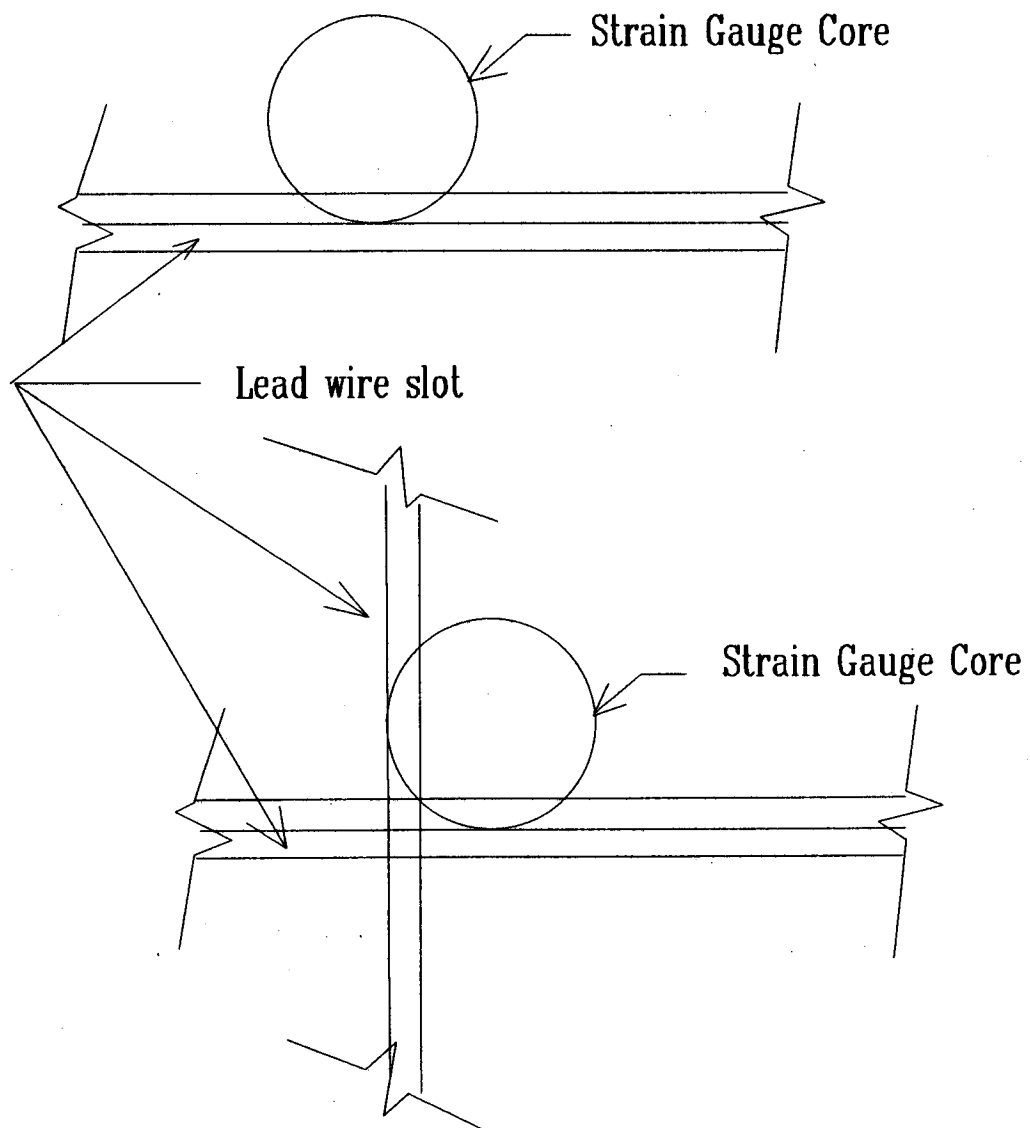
Plan View of Lead Wire Slots Bisecting Core Holes
